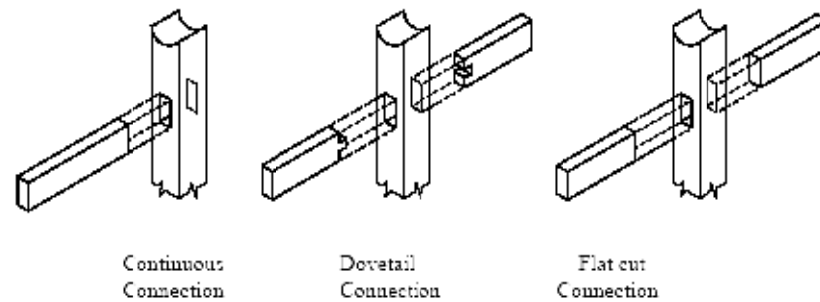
Three types of beam to column joints (Chang 2006)
